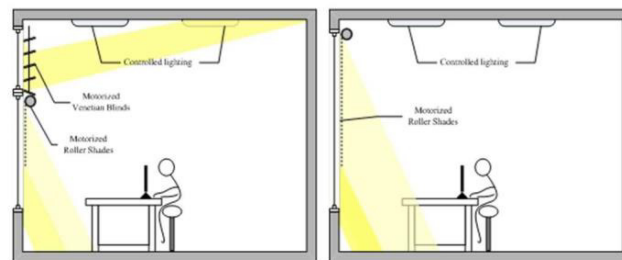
Multi-Sectional Façade (left); Traditional façade(right)
